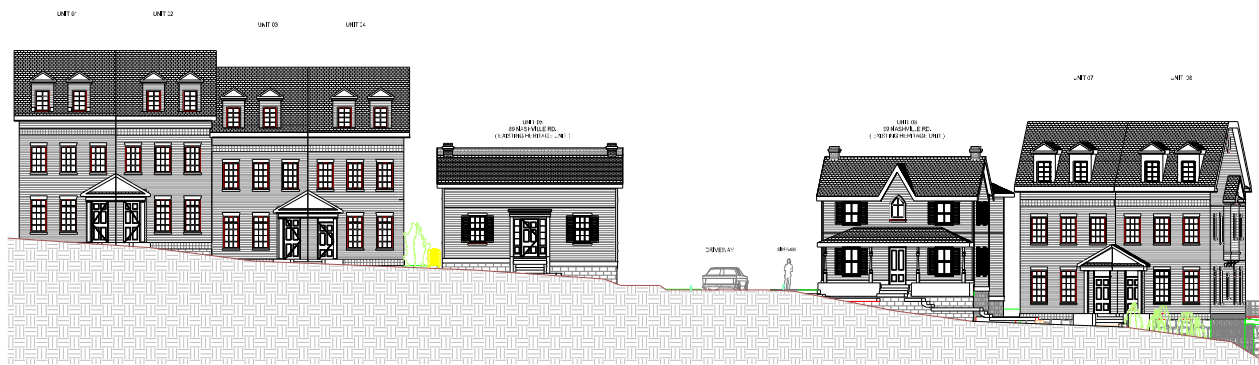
Nashville Road elevation. The heritage houses are set on either side of the vehicular and pedestrian entrance to the site. They function as gateway markers for the project, and the location allows views of their side elevations from Nashville Road.
